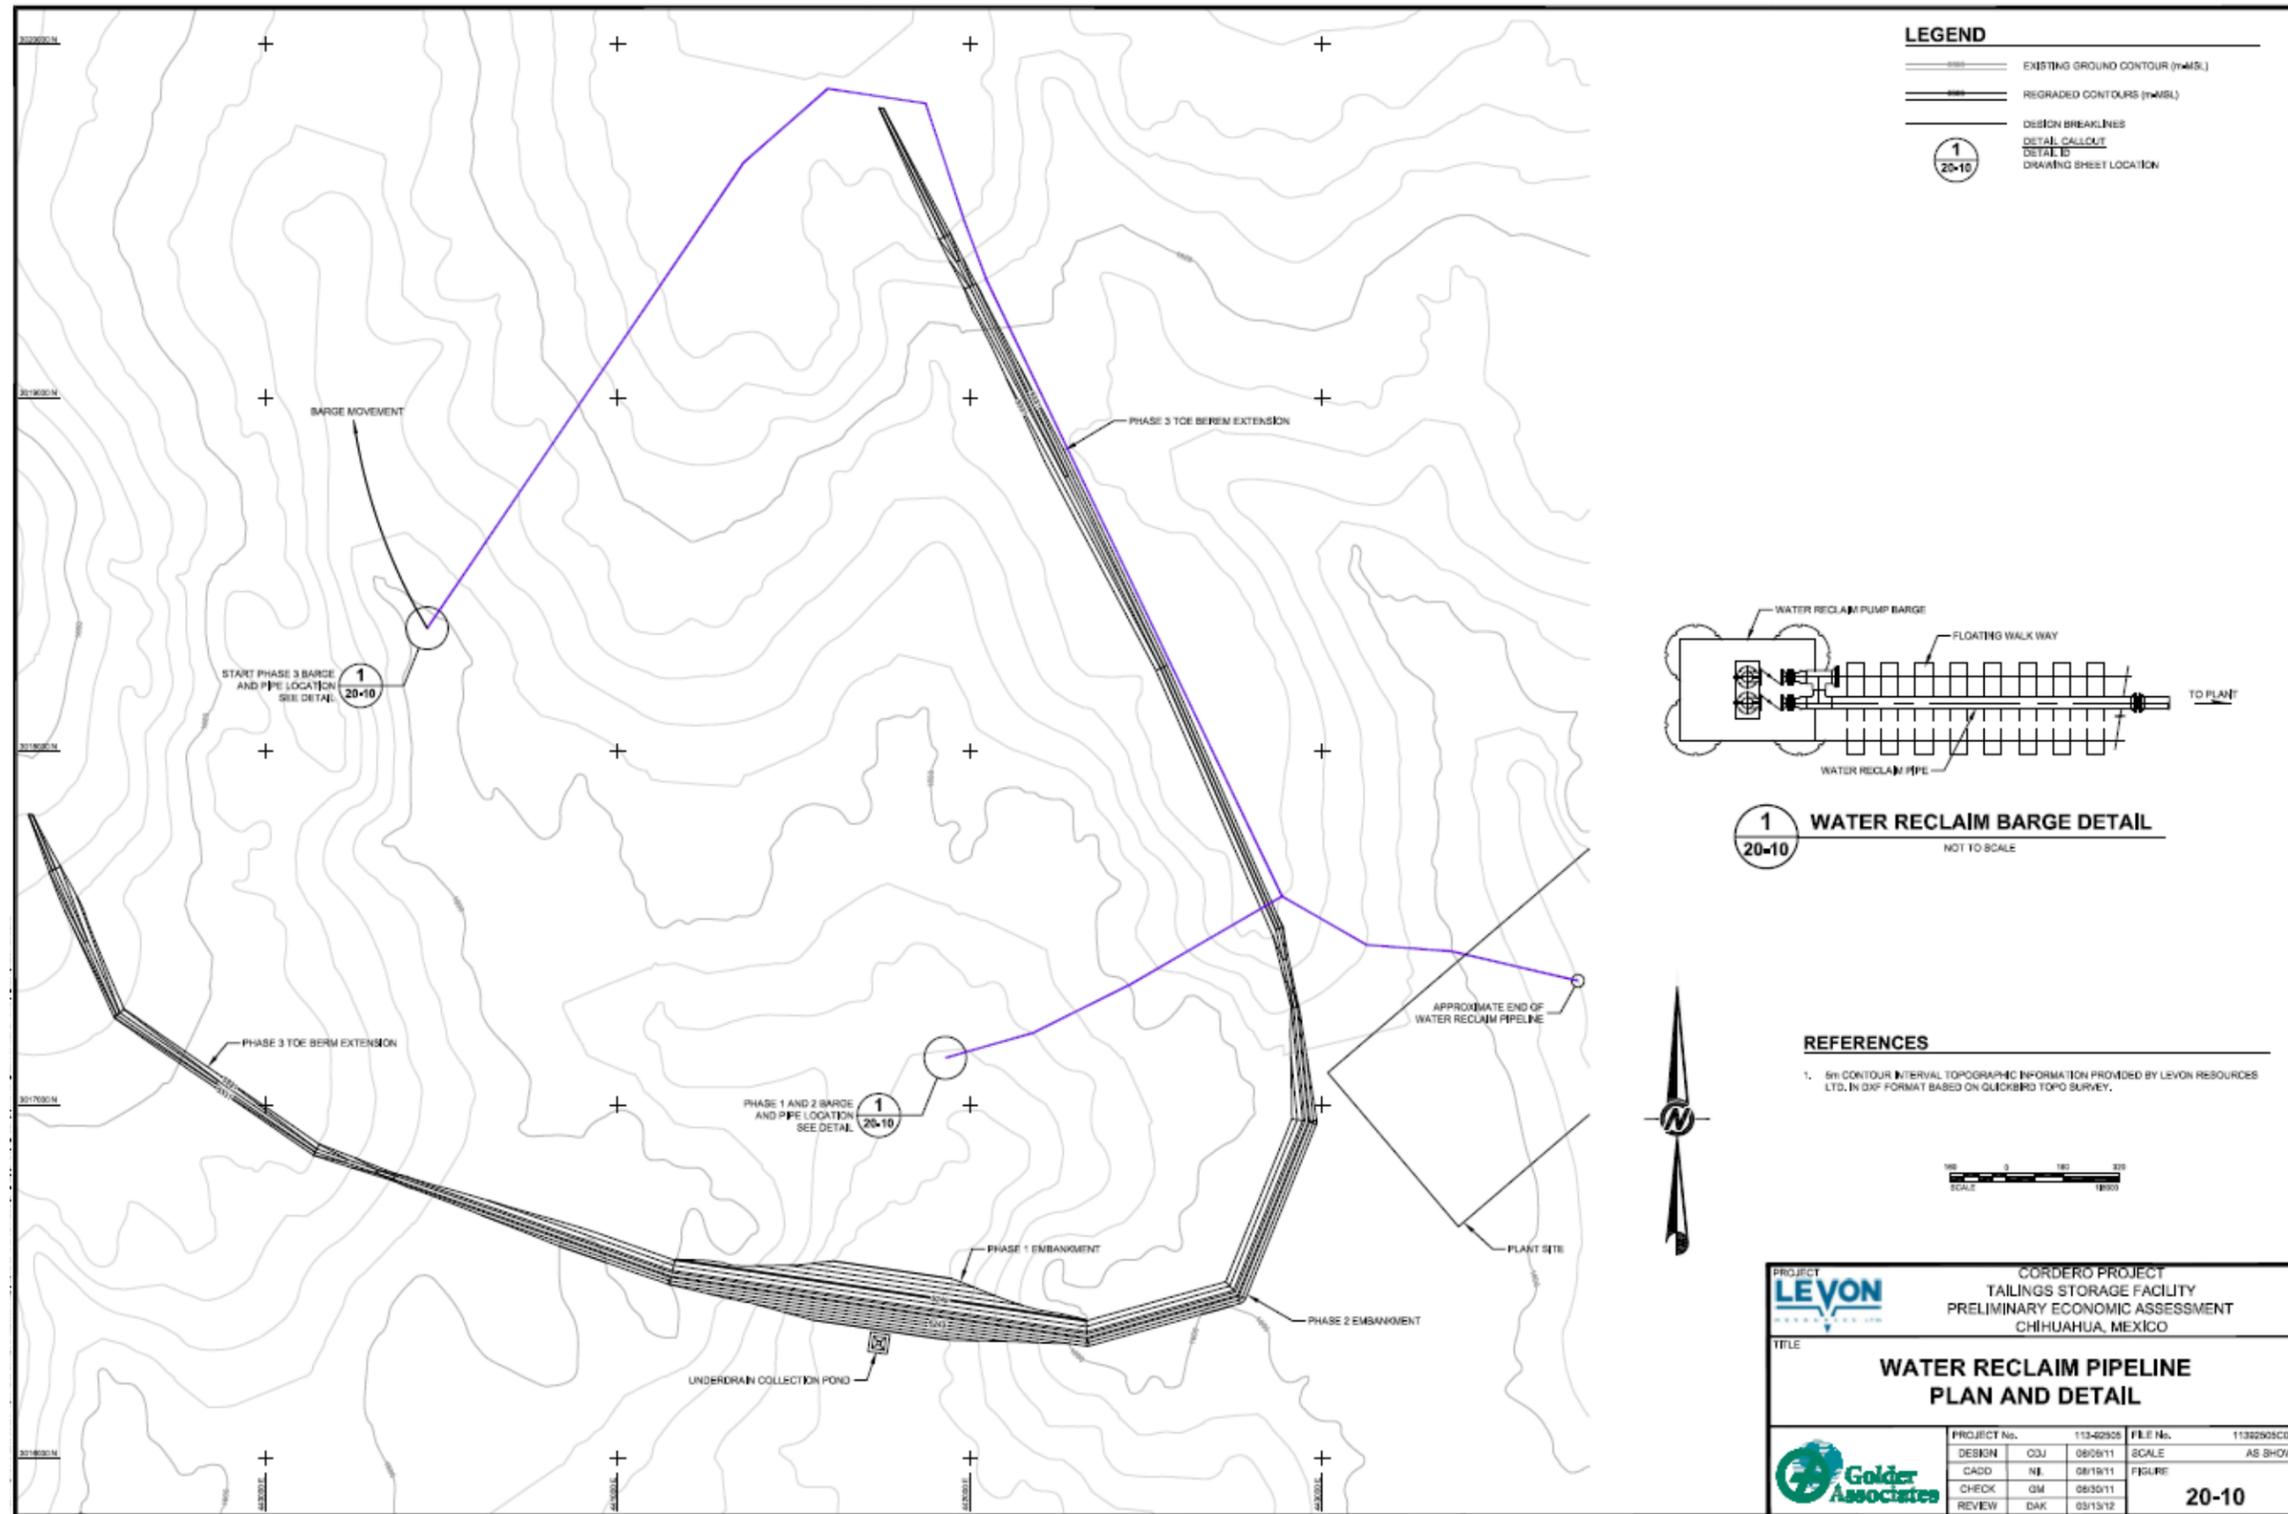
Water Reclaim Pipeline Plan and Detail
